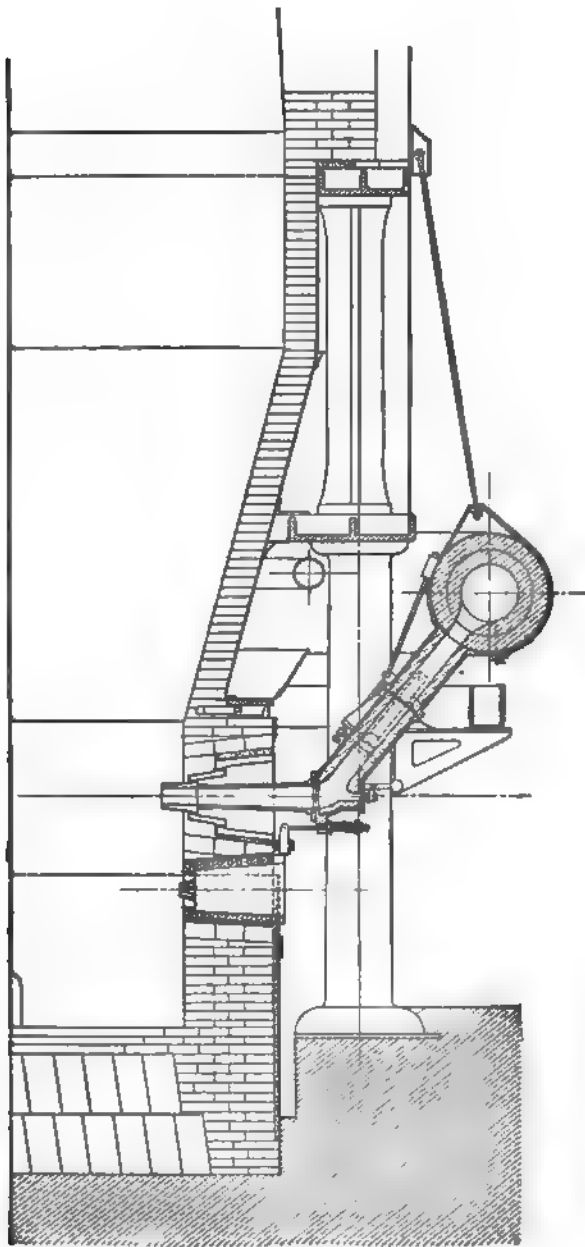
FIG. II-B.—BOSH CONSTRUCTION AT STEELTON, PA.
